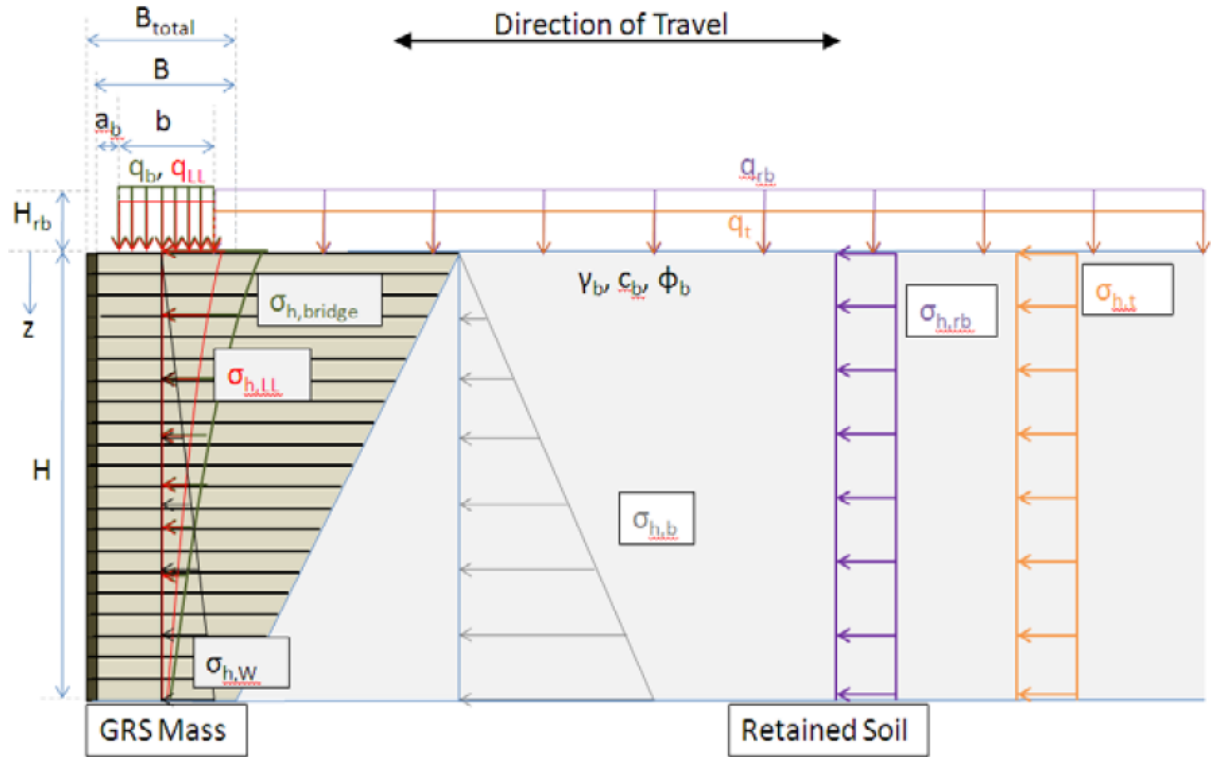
Typical vertical and lateral pressures on a GRS abutment (Adams et al. 2011a).
